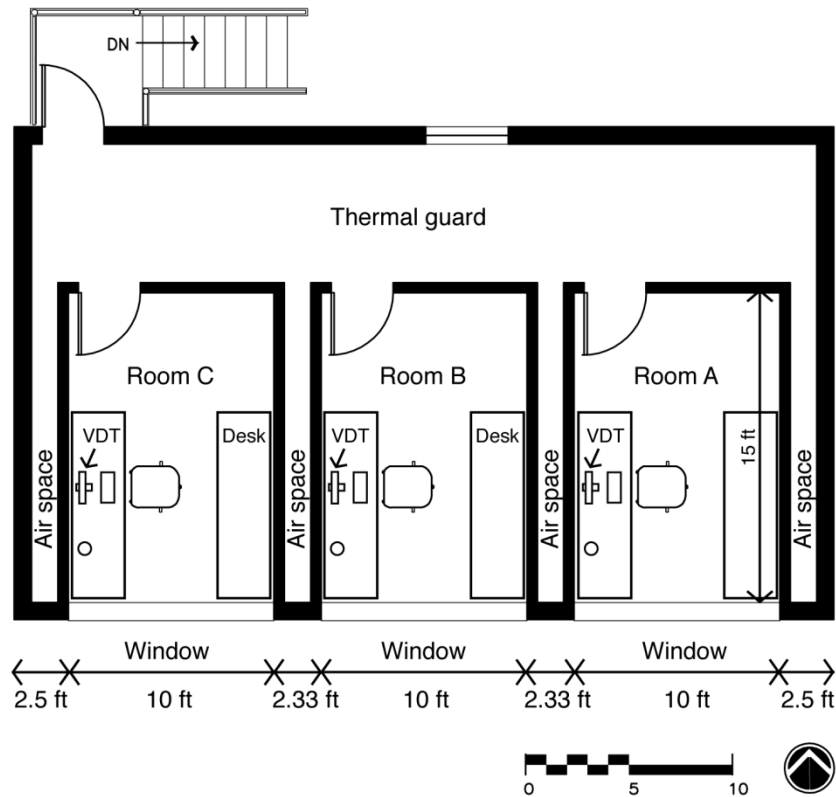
Floor Plan of The LBNL Windows Testbed Facility
